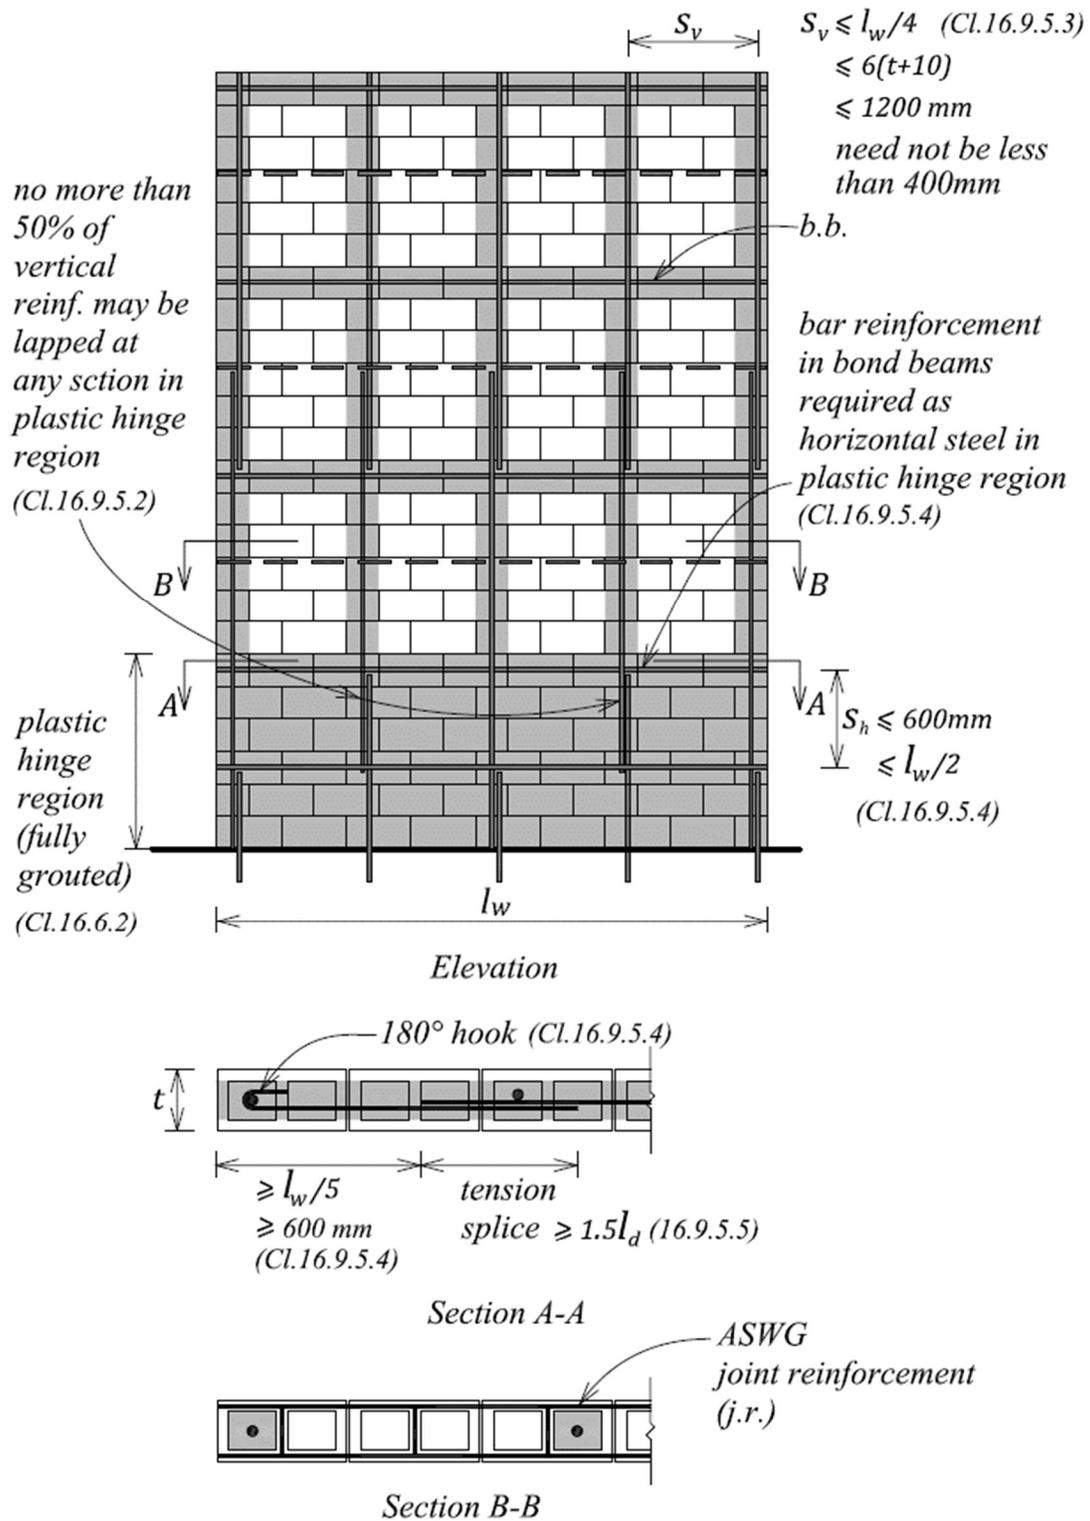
Ductile reinforced masonry shear walls: additional CSA S304-14 seismic reinforcement requirements.
